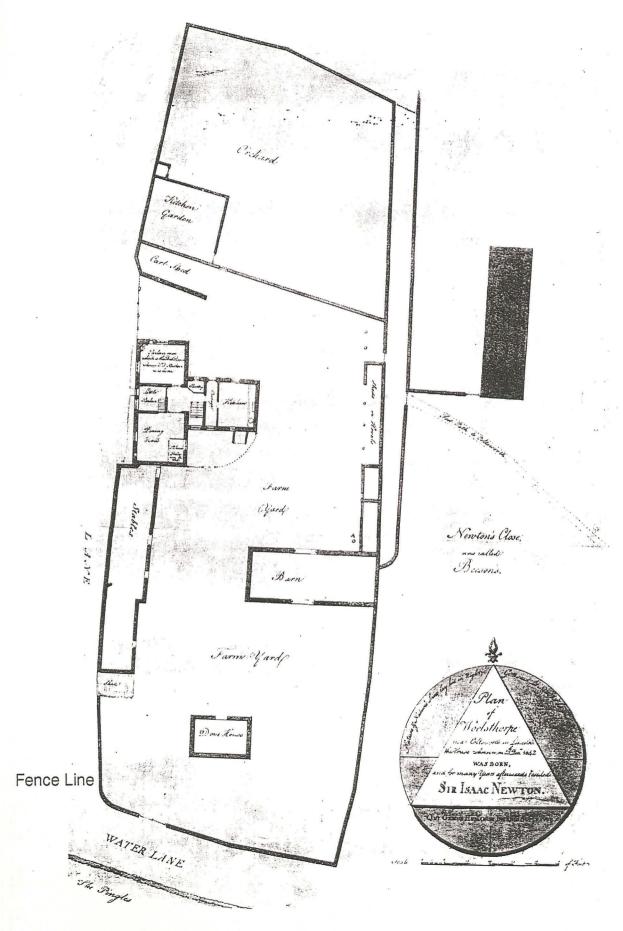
Plan of Woolsthorpe taken from J.C Barrows 1797 plan
